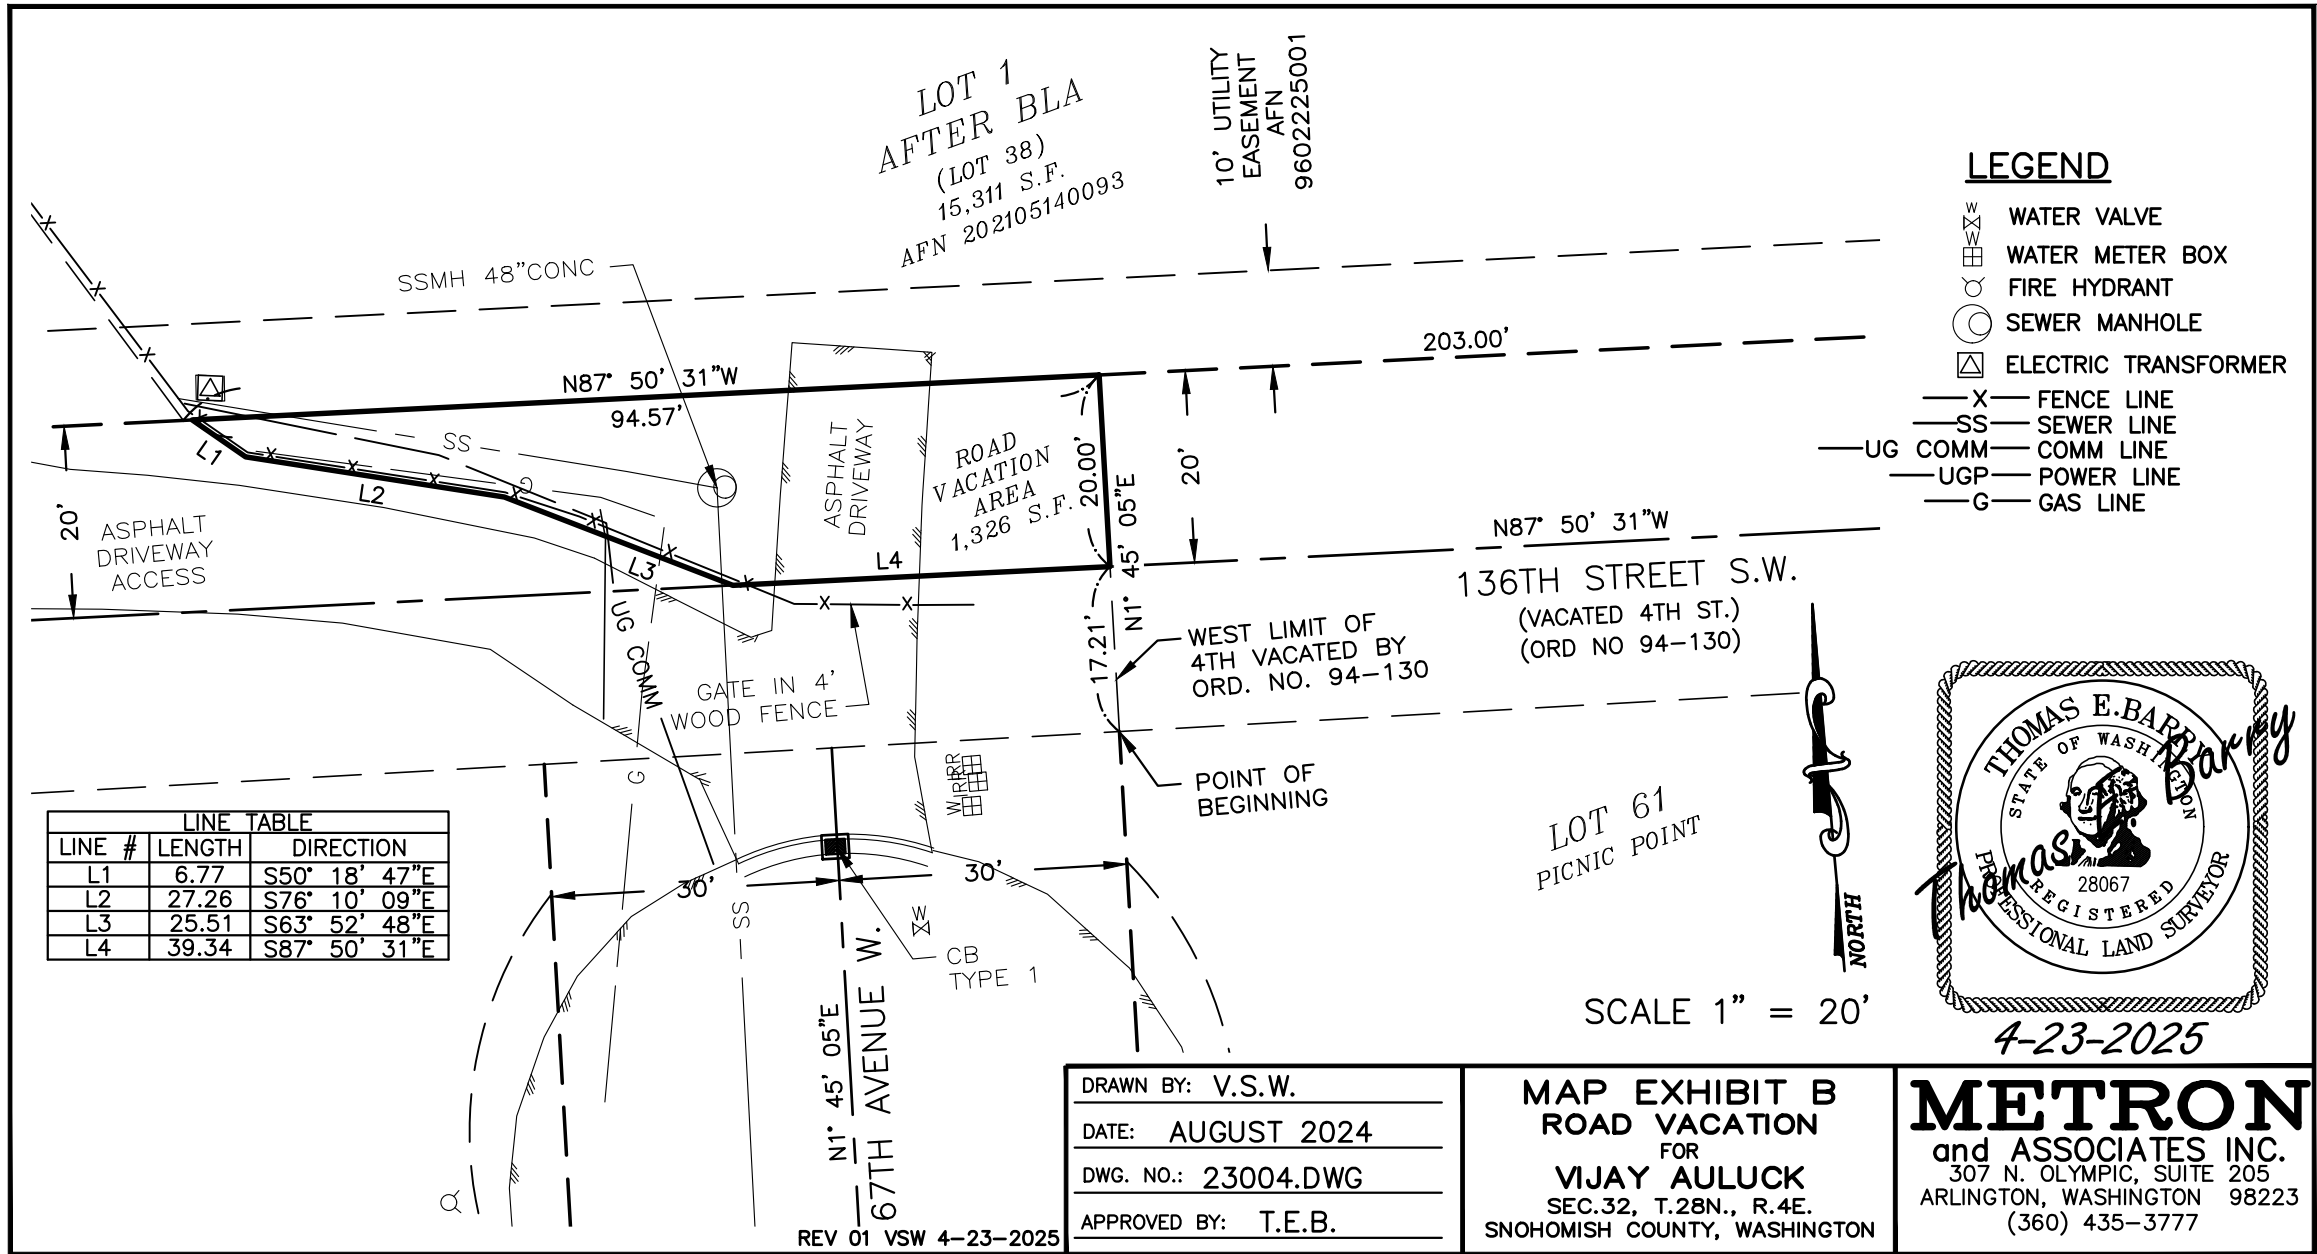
Exhibit B Site Plan map pg. 2
